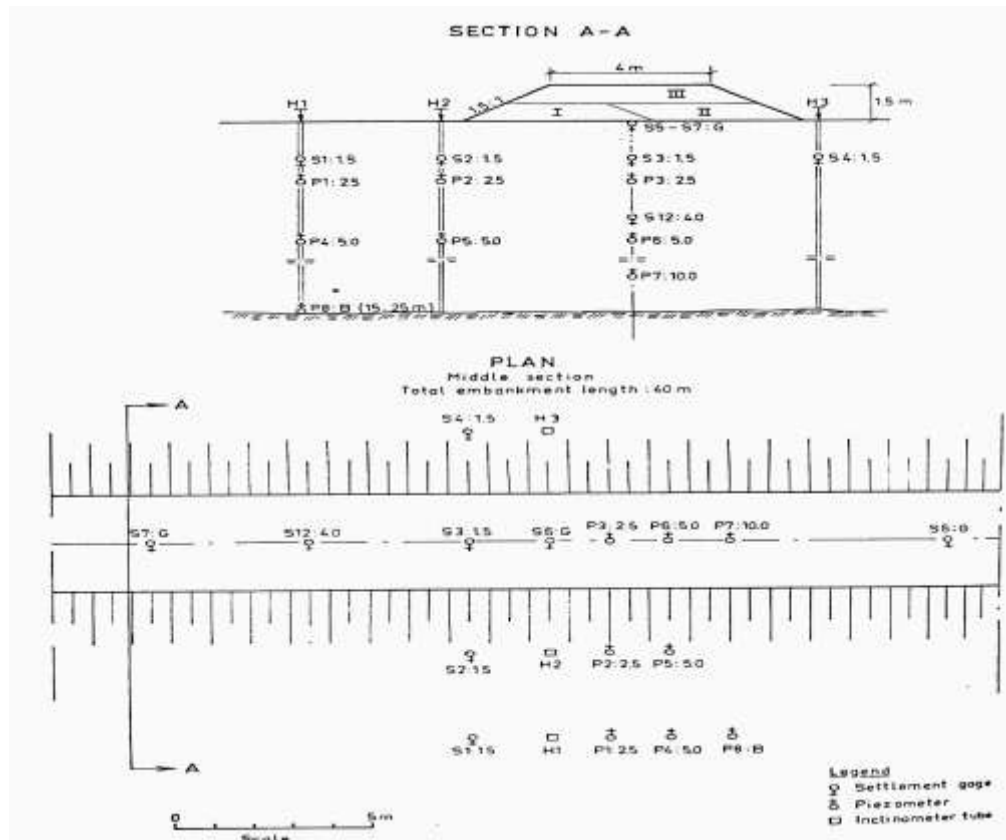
Plan and section of Skä Edbey embankment showing gage locations and depth below ground surface in meters) (from Holtz, 1972).
